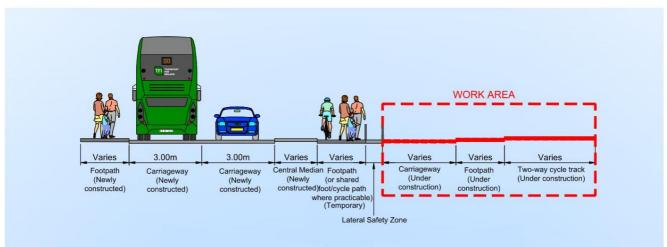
Traffic Management Cross Section, Section 11 – Stage 2
